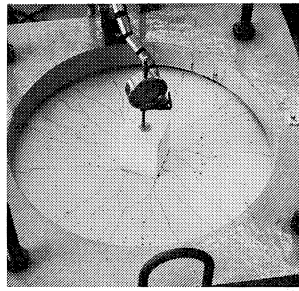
Set-up for testing the eccentrically loaded specimens.
